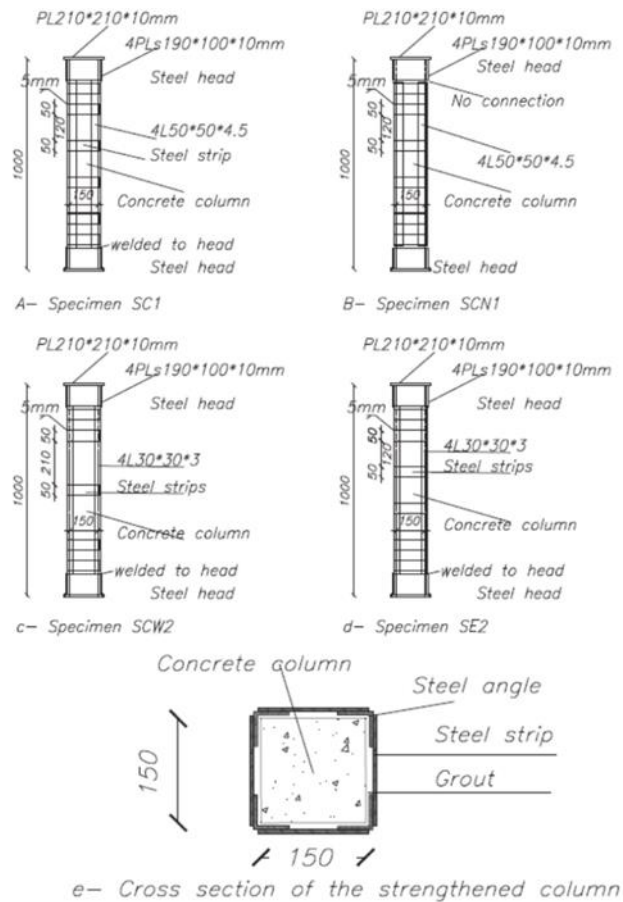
Detail of some strengthened specimens (Tarabia and Albakry, 2014)
